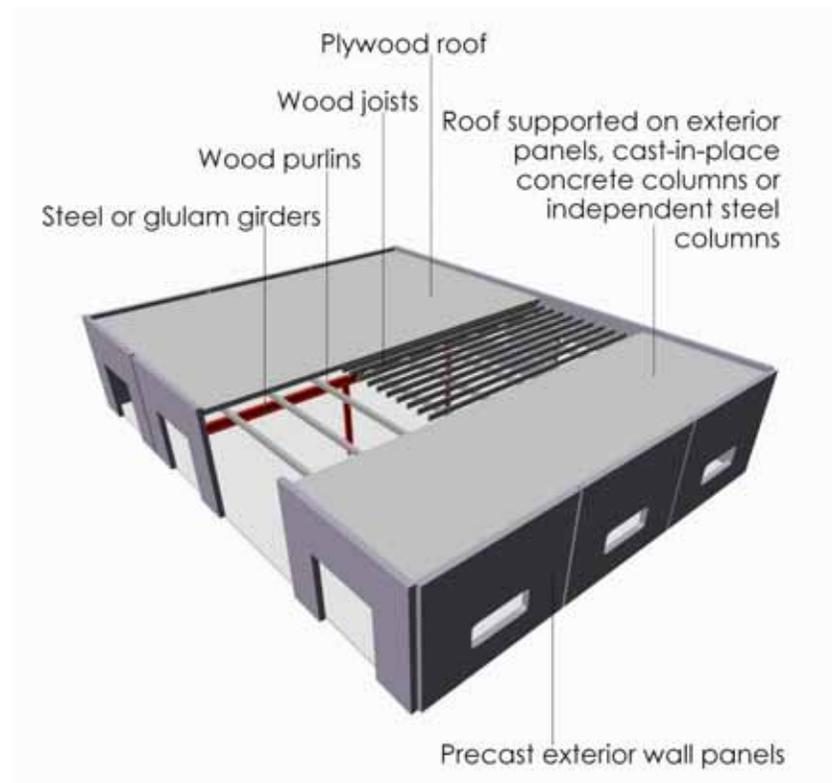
Building Type PC1: Tilt-Up Concrete Shear Walls
